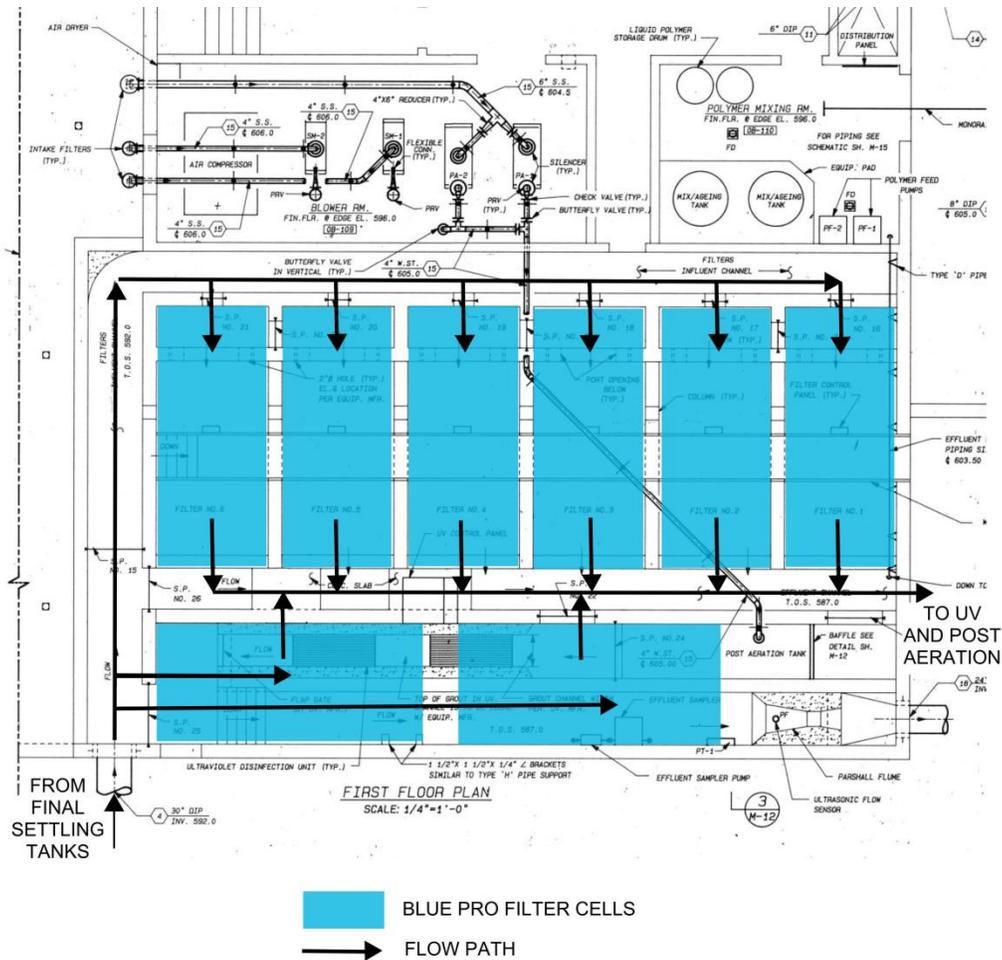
BLUE PRO ALTERNATIVE PROCESS LAYOUT
